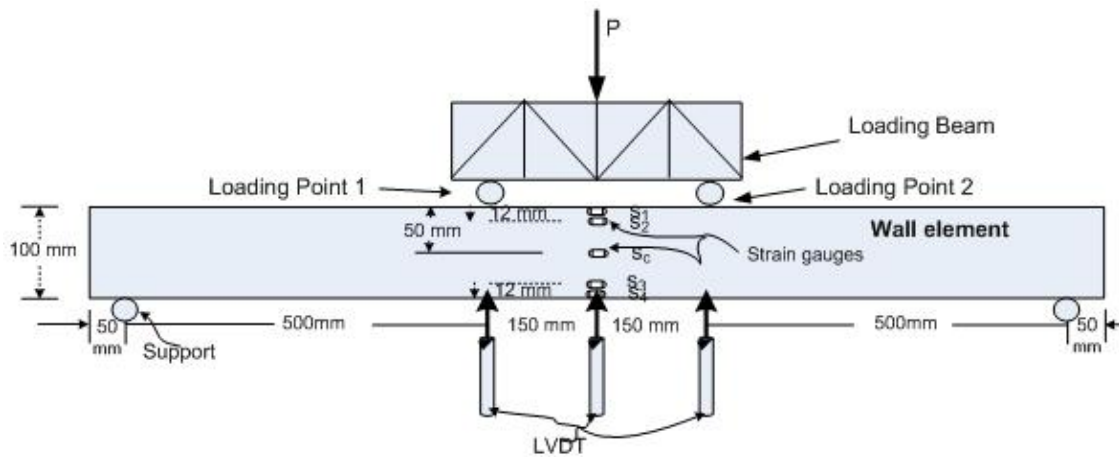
Schematic diagram of instrumentation and testing of wall elements
